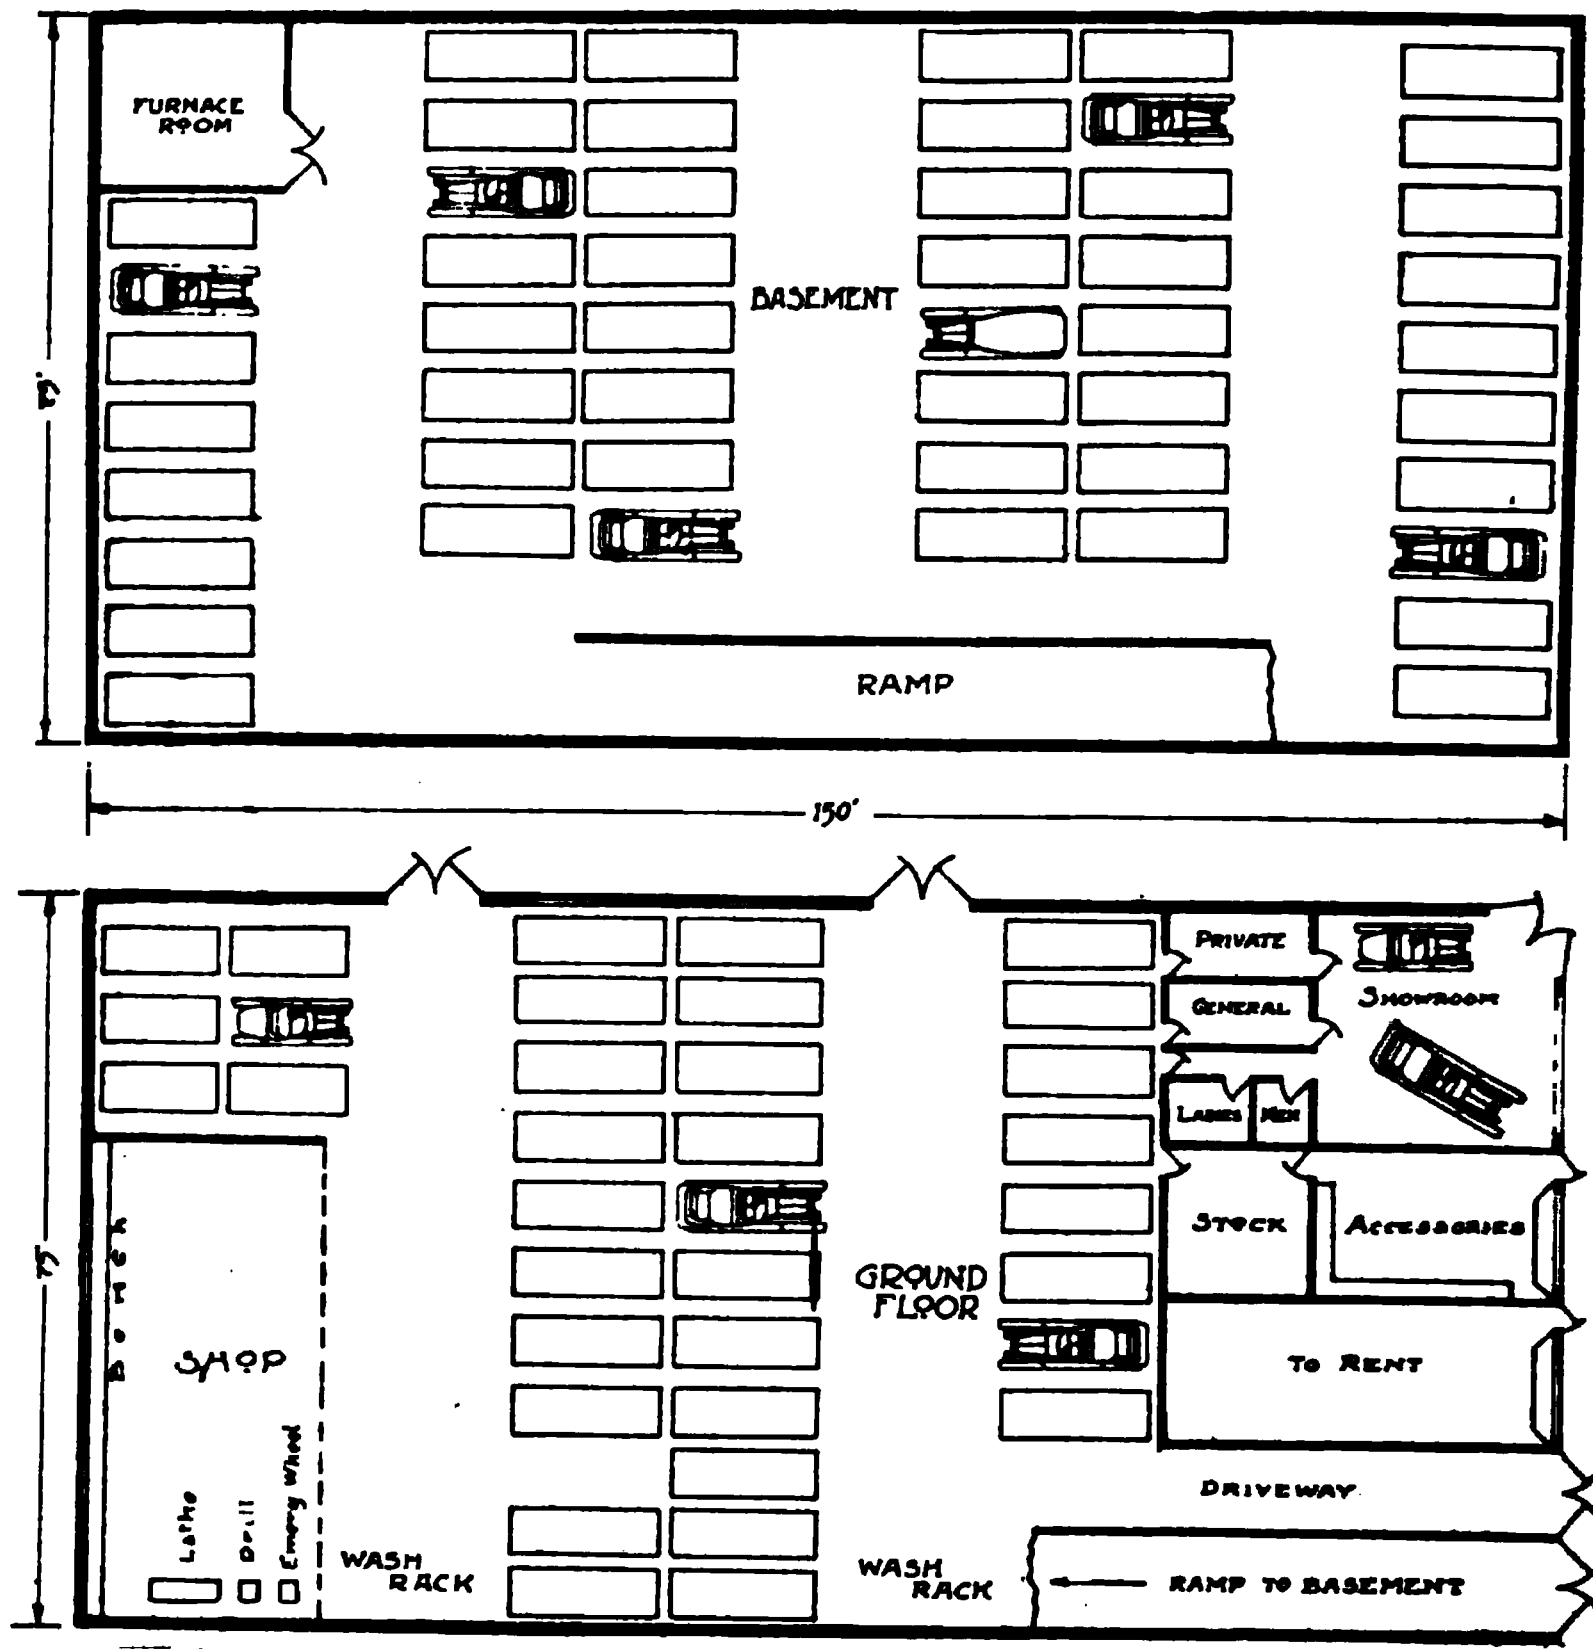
Basement and Ground Floor of a Large Garage, Using Ramps
